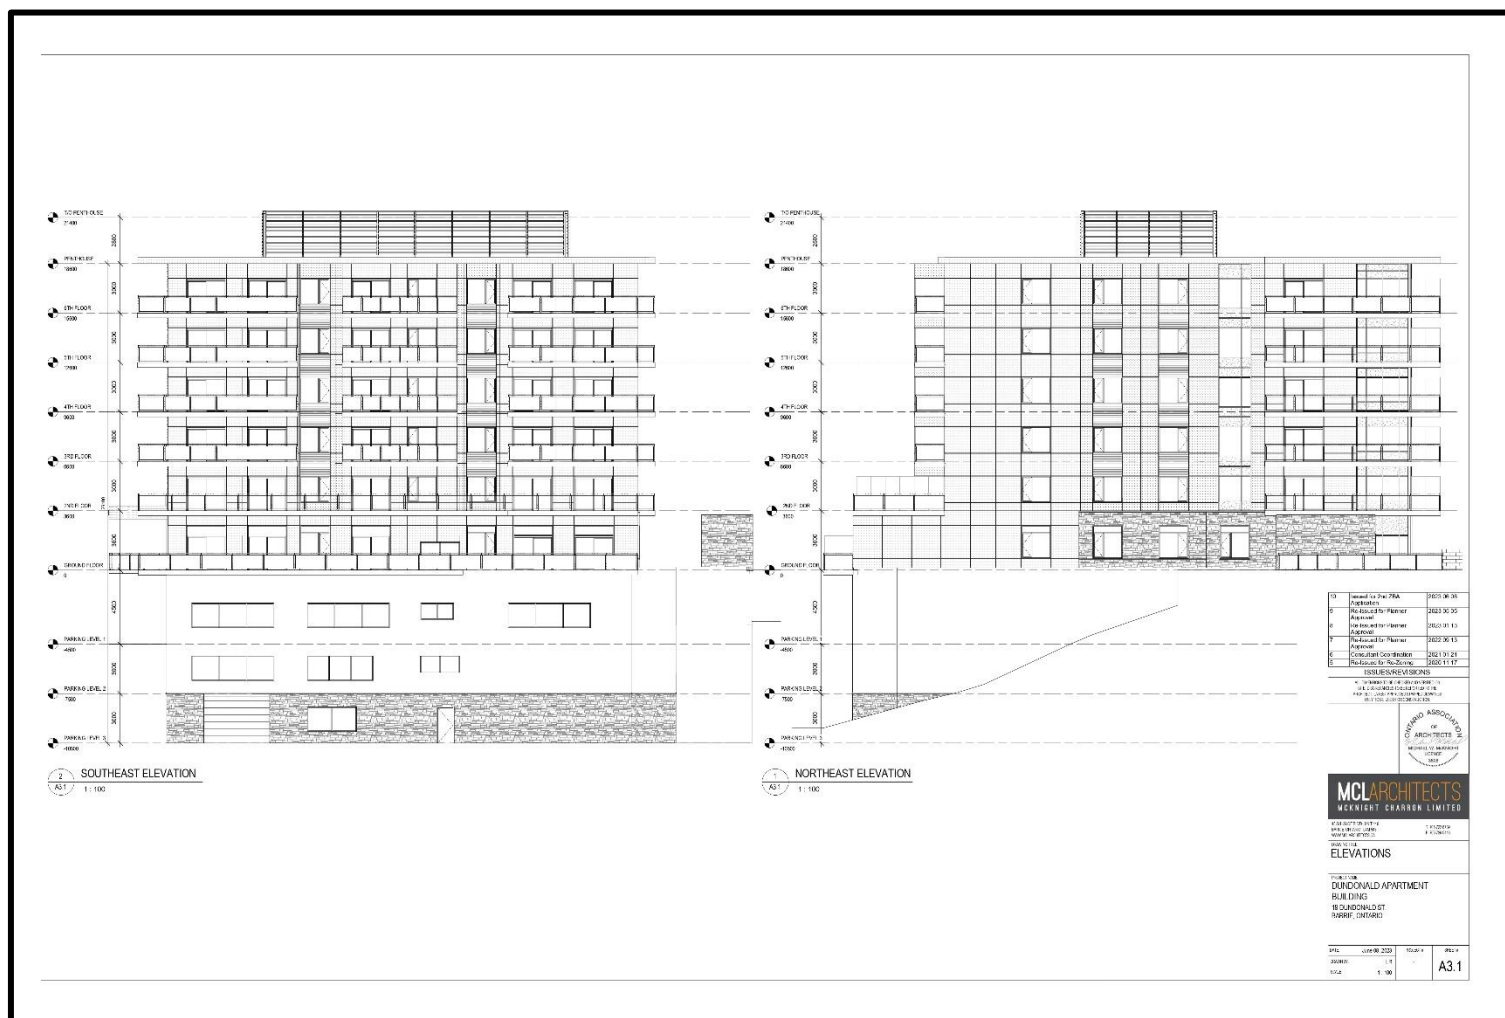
Proposed Development – Southeast and Northeast Elevation
